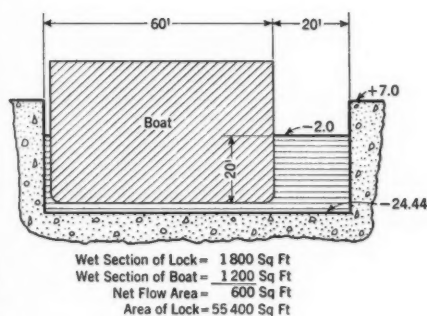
TYPICAL CROSS SECTION OF LOCK
